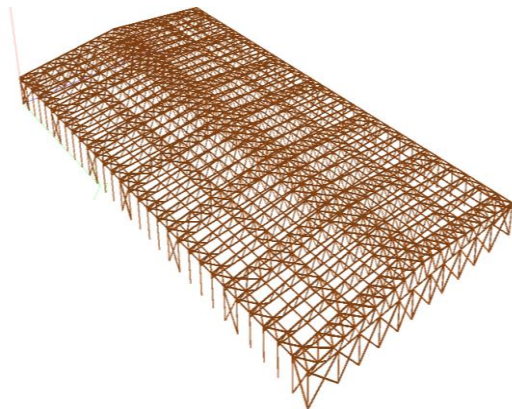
3D Model of Truss Arrangement Configuration(90x180m)
